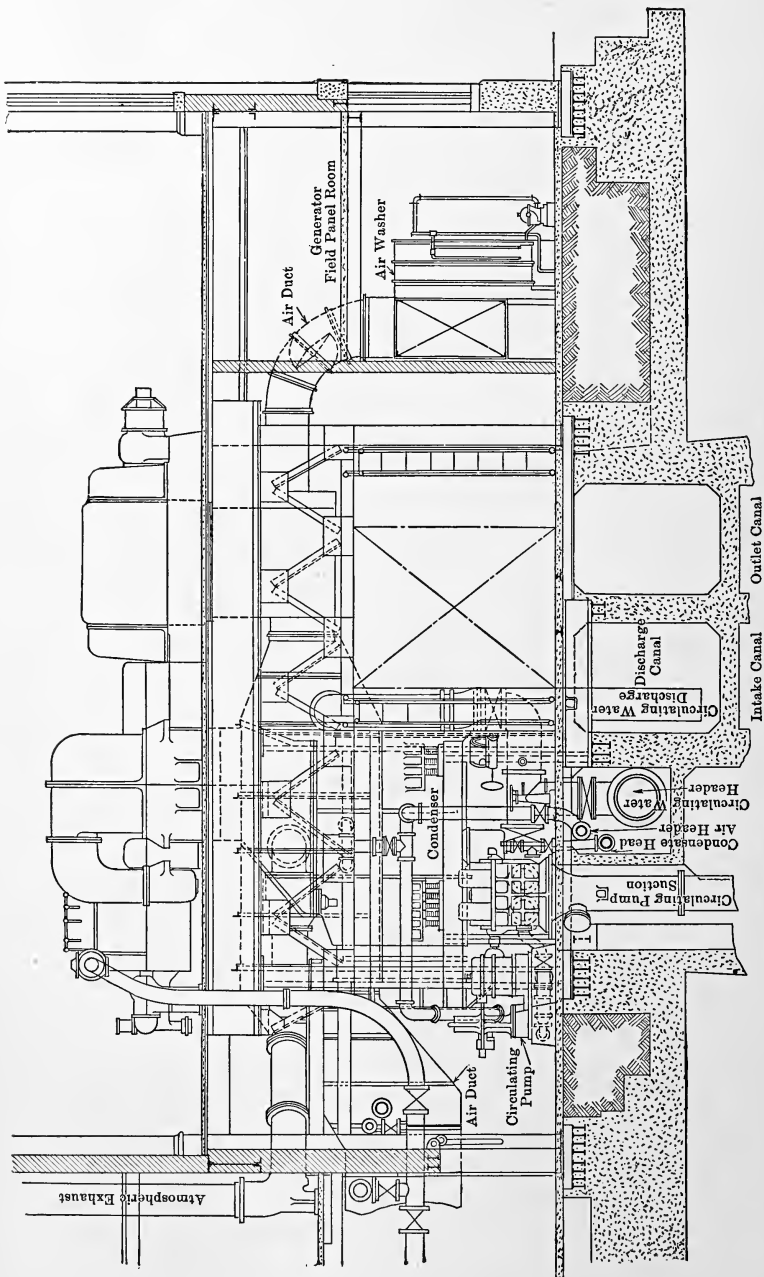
Essex Station. — Side Elevation, Turbine Equipment.
